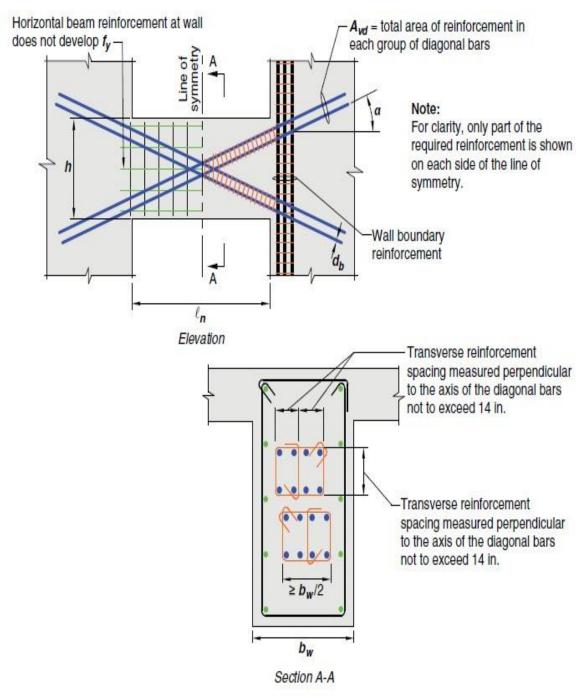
Confinement of individual diagonals in coupling beams with diagonally oriented reinforcement. Wall boundary reinforcement shown on one side only for clarity.
